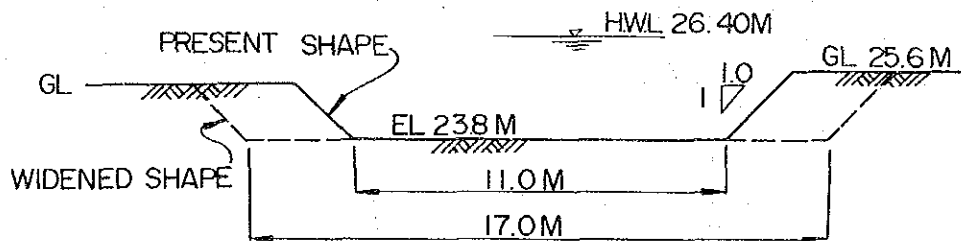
Typical Cross-section of Girai-Nilkamal Pass
